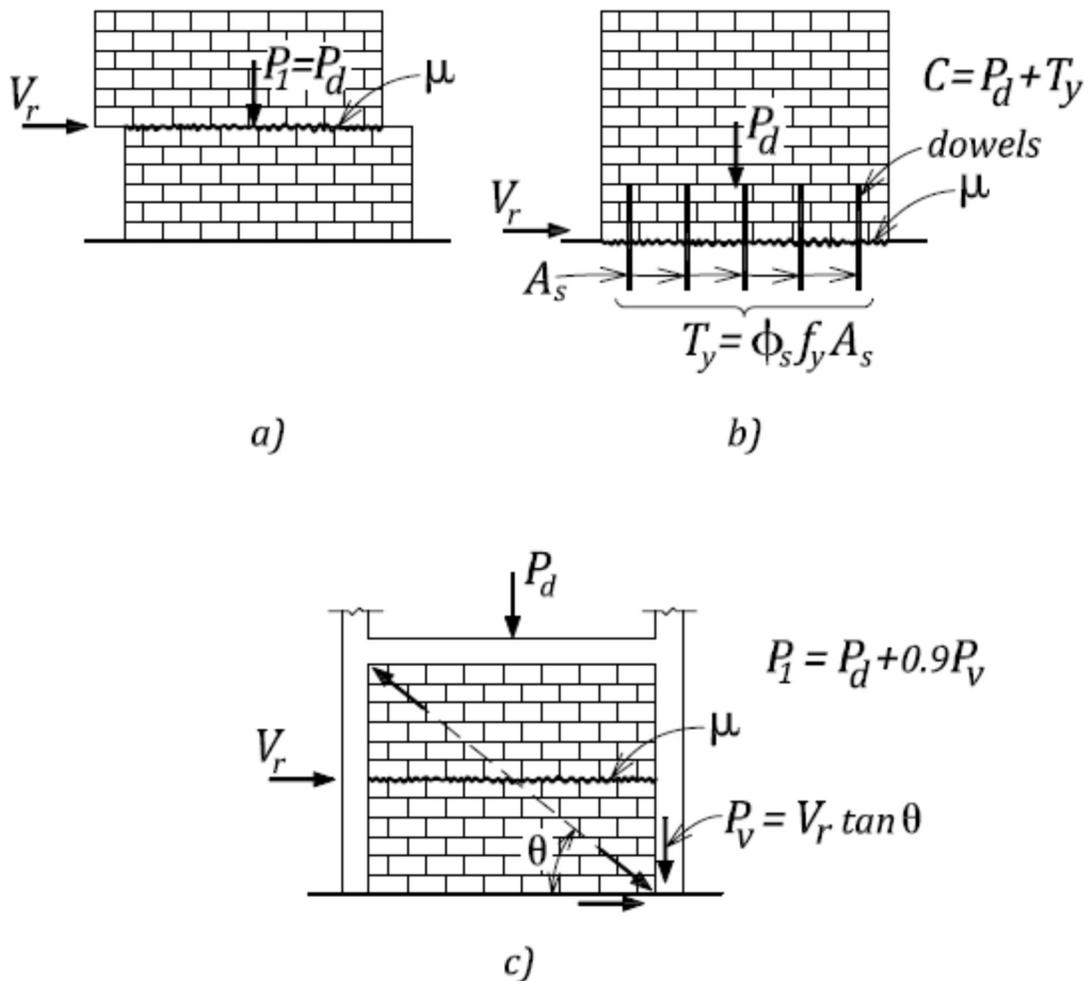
Sliding shear failure mechanism: a) bed-joint sliding; b) sliding at the base of the wall; c) sliding shear in infilled masonry walls.
